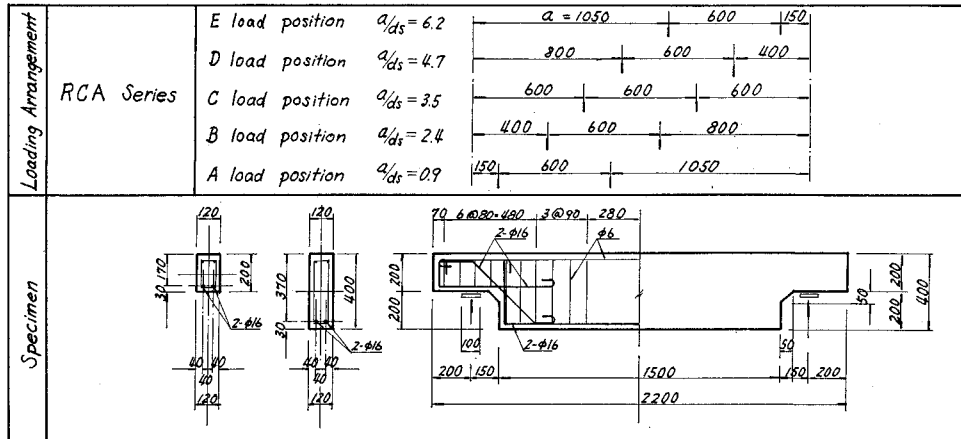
Specimens and loading arrangement of reinforced concrete rectangular beams (moving load test).
